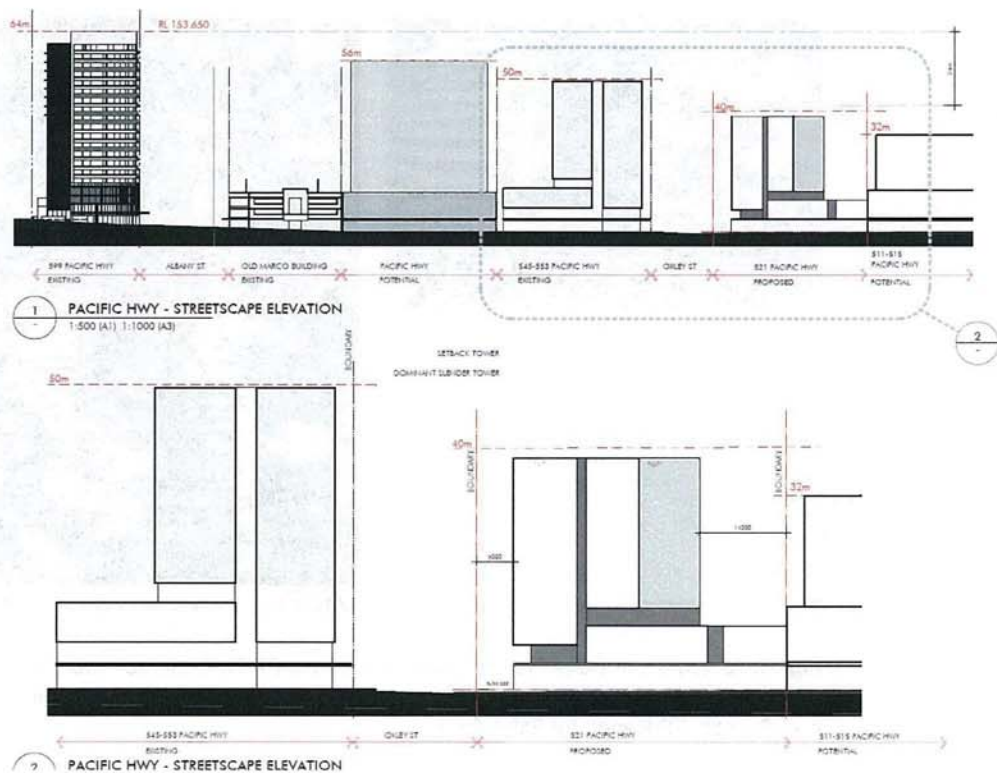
Pacific Highway Streetscape Elevation demonstrating that the proposed building height of 40m is in keeping with the future desired character for stepped building forms (Source: Architectural Indicative Scheme)
